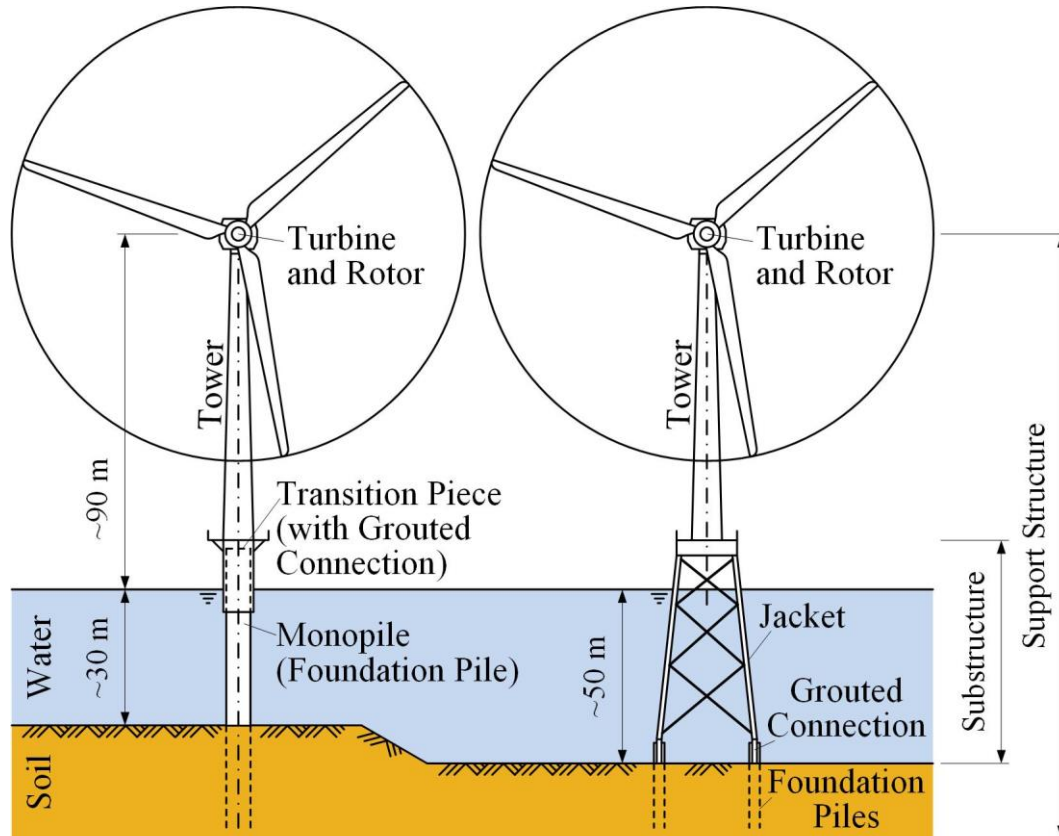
Typical support structures for offshore wind turbines and positions of grouted connections
